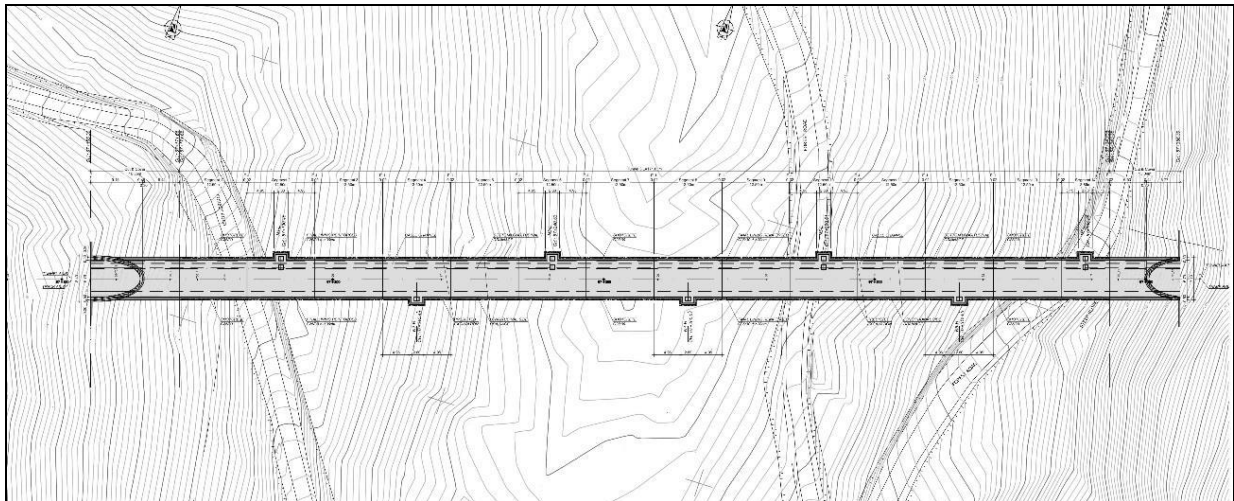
Example of crossing with forest roads. Preliminary Design of Tunnel 03
